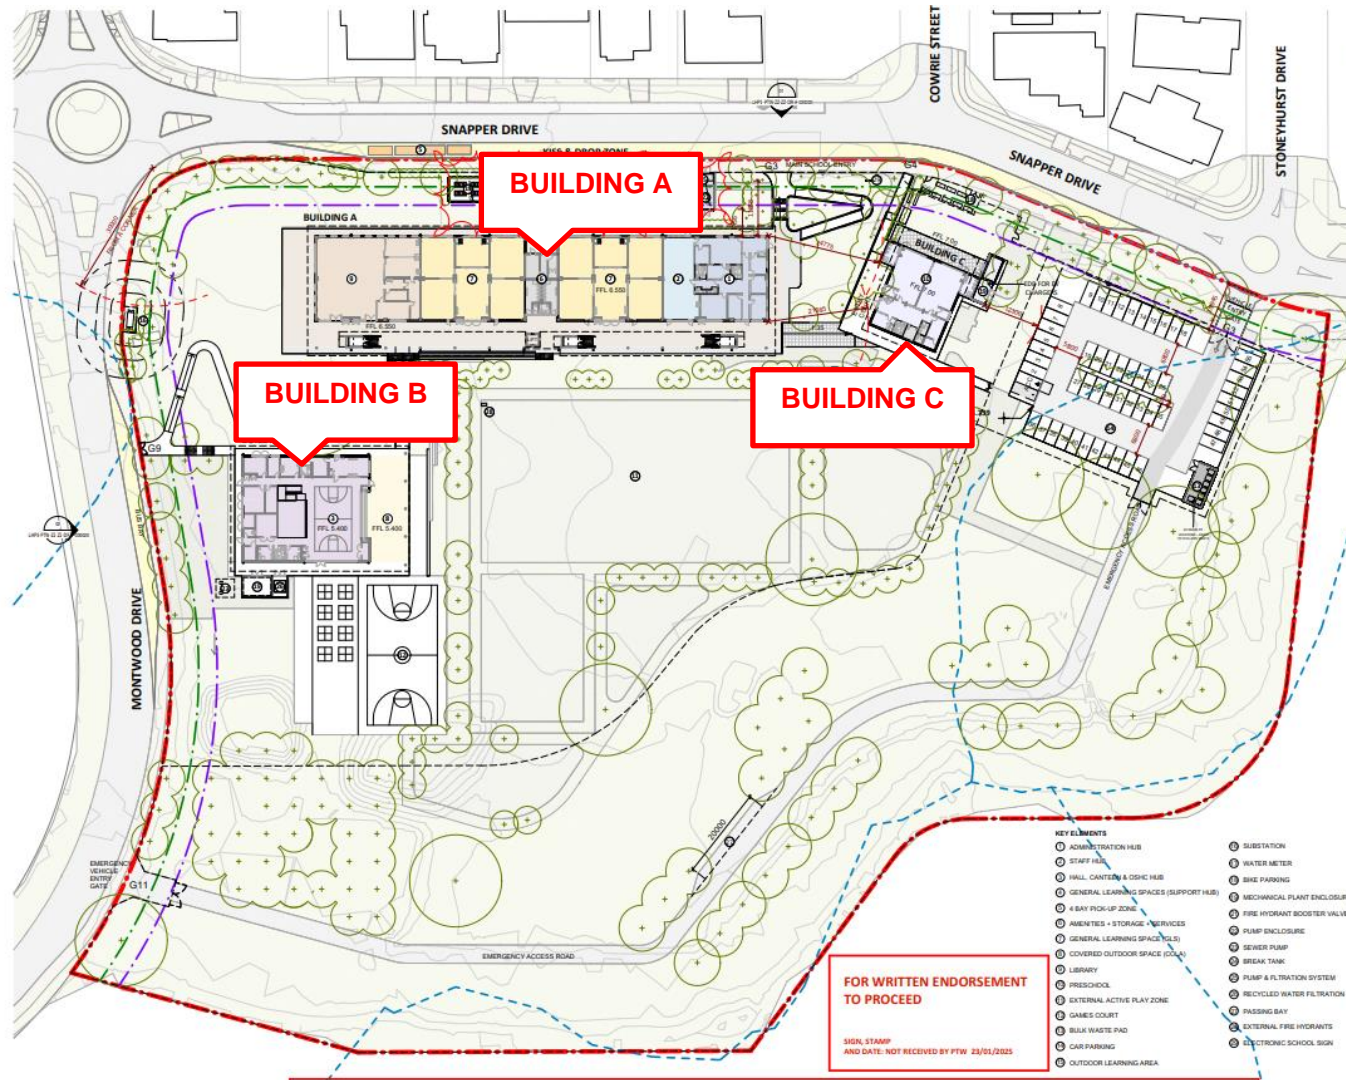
Ground Floor Site Plan (PTW Architects, 2025)
